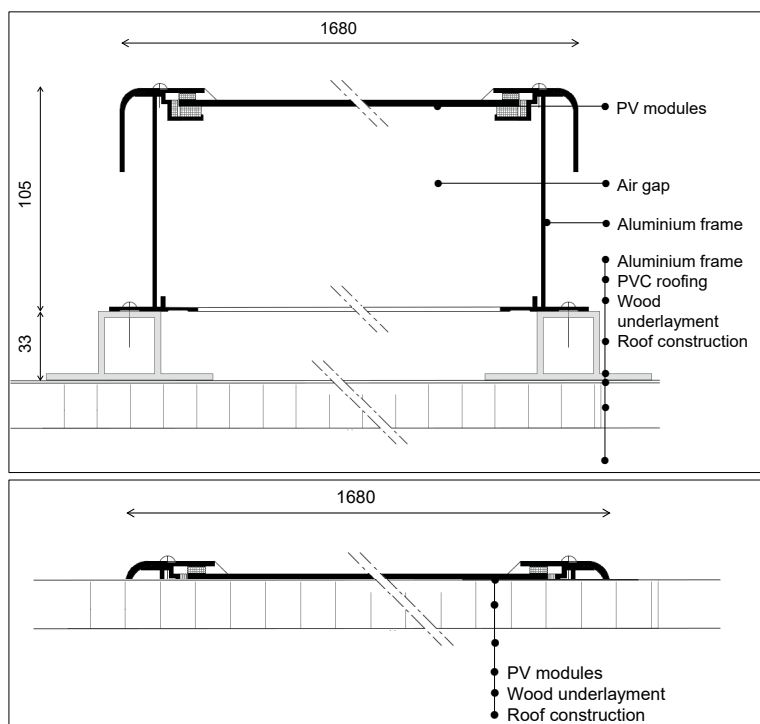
Technical horizontal section of the ventilated BIPV rooftop design (top) and non-ventilated BIPV rooftop design (bottom) (sizes in mm).
